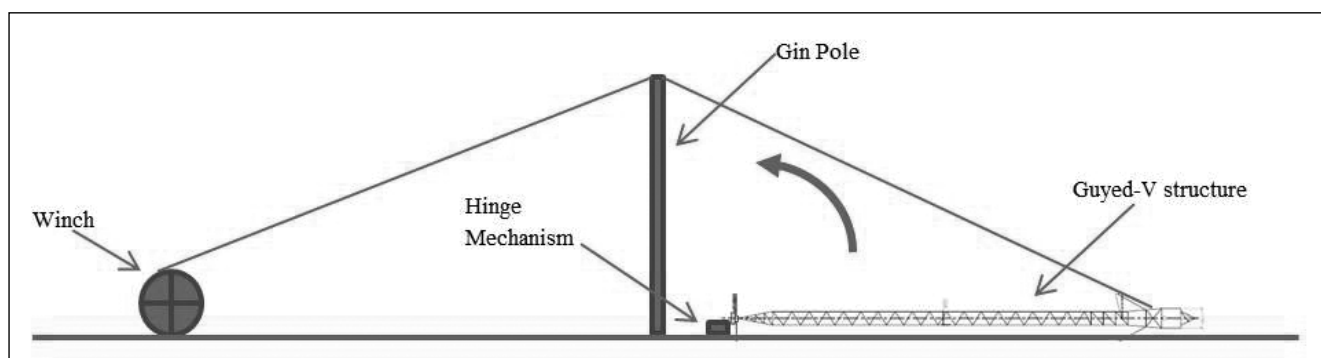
Side view of tower, gin pole and winches prior to lifting the tower
